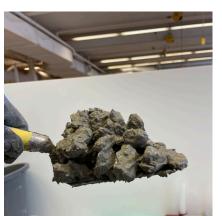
Casting concrete and rebar to replicate carved window mouldings of Montreal's Notre-Dame Basilica, December 2022.
